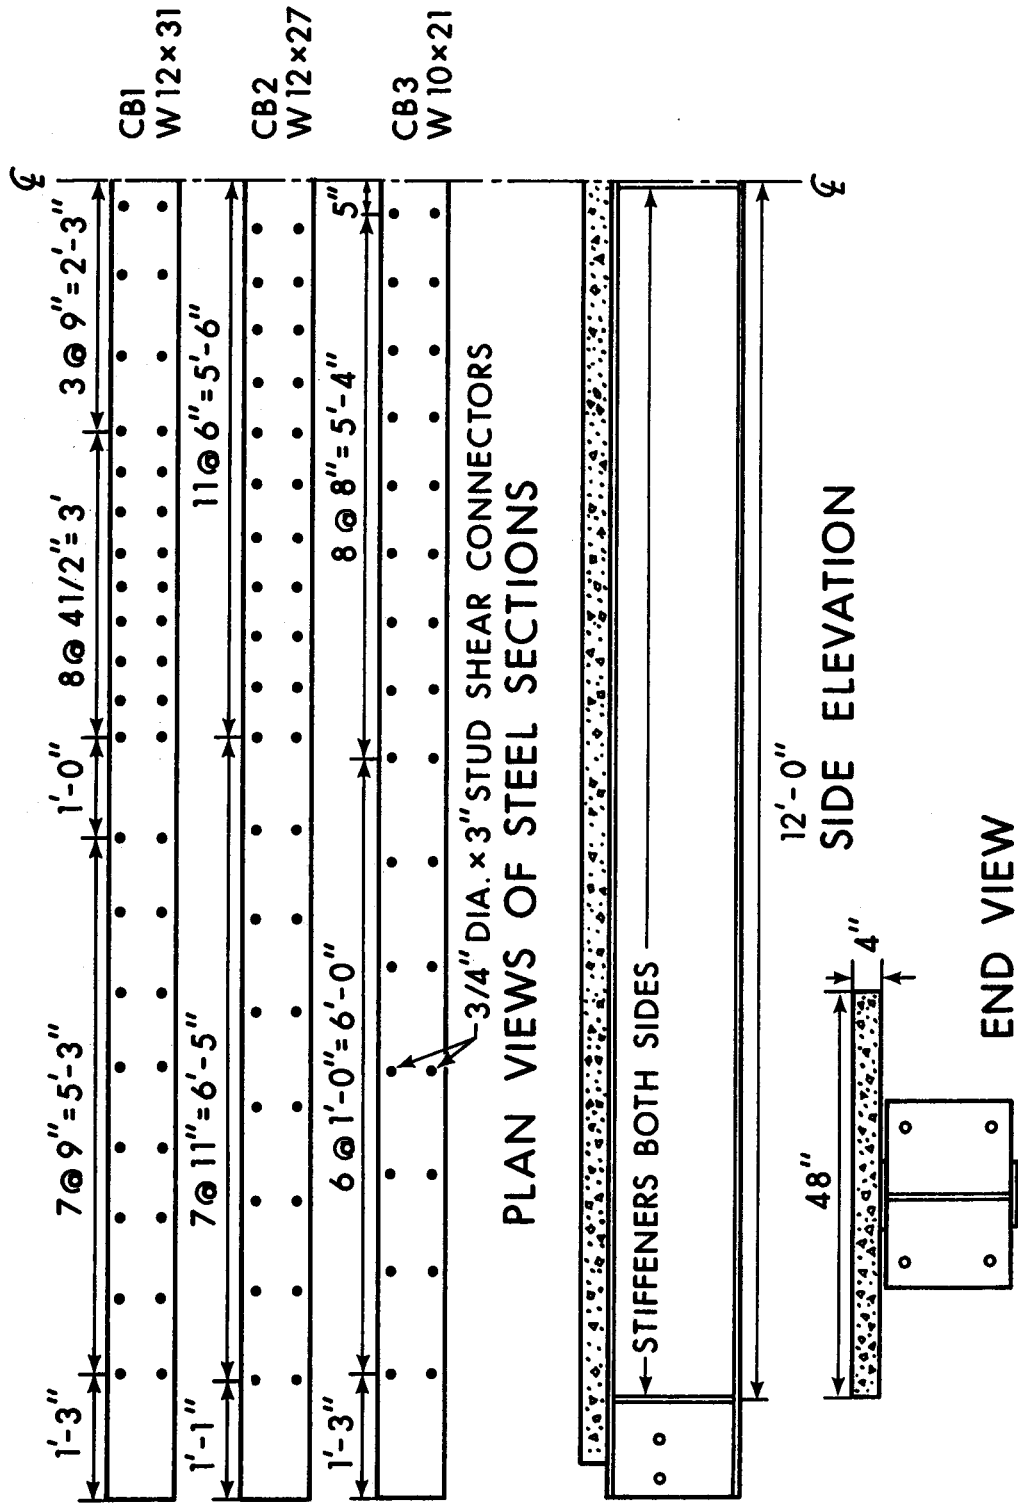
DETAILS OF TEST SPECIMENS
